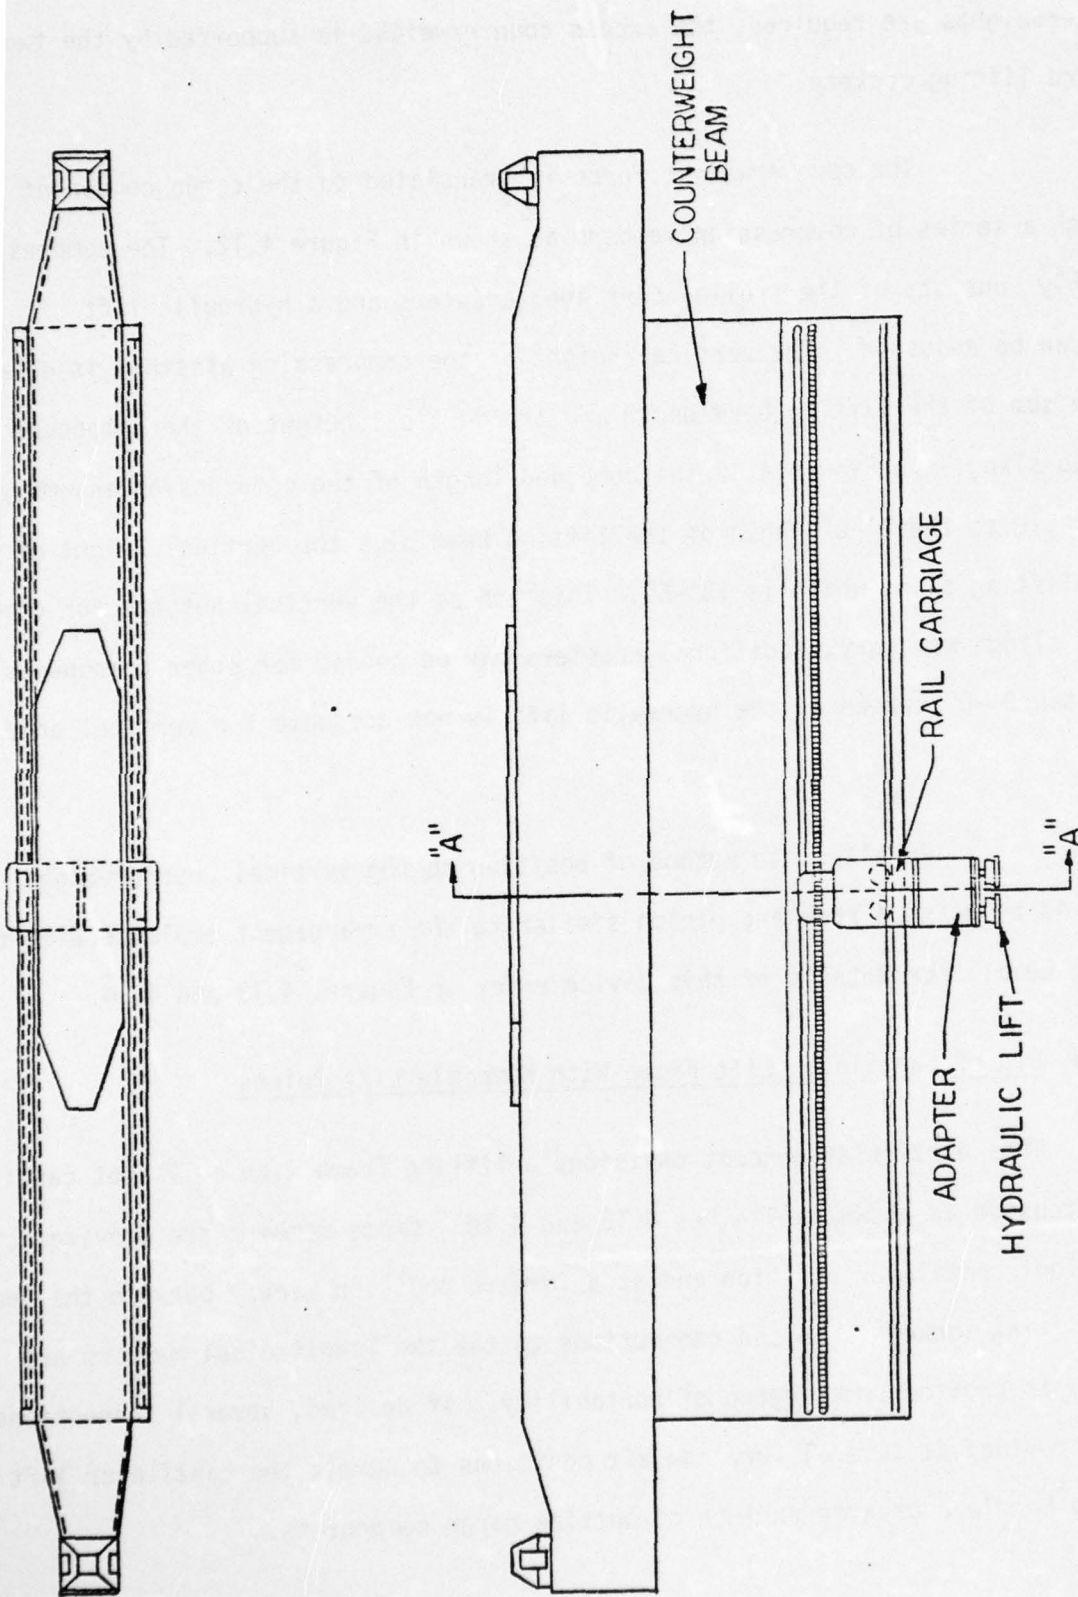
Counterweight Beam With Rail Carriage - Elevation and Plan
